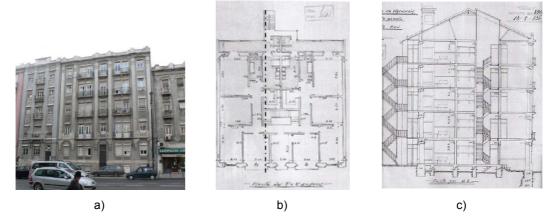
'Gaioleiro' building located at Almirante Reis Avenue (Jesus, 2007): a) Front façade wall; b)
